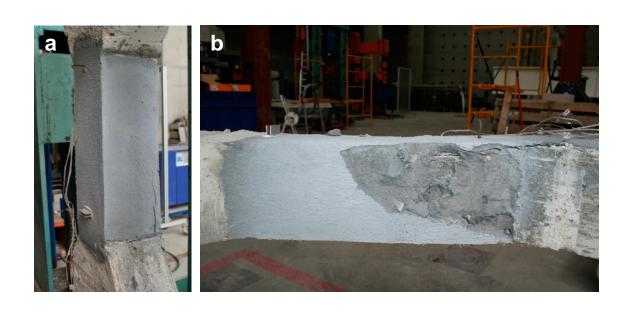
Failure modes: Specimen R4 (repaired column with Class R4 mortar without bonding agent)
